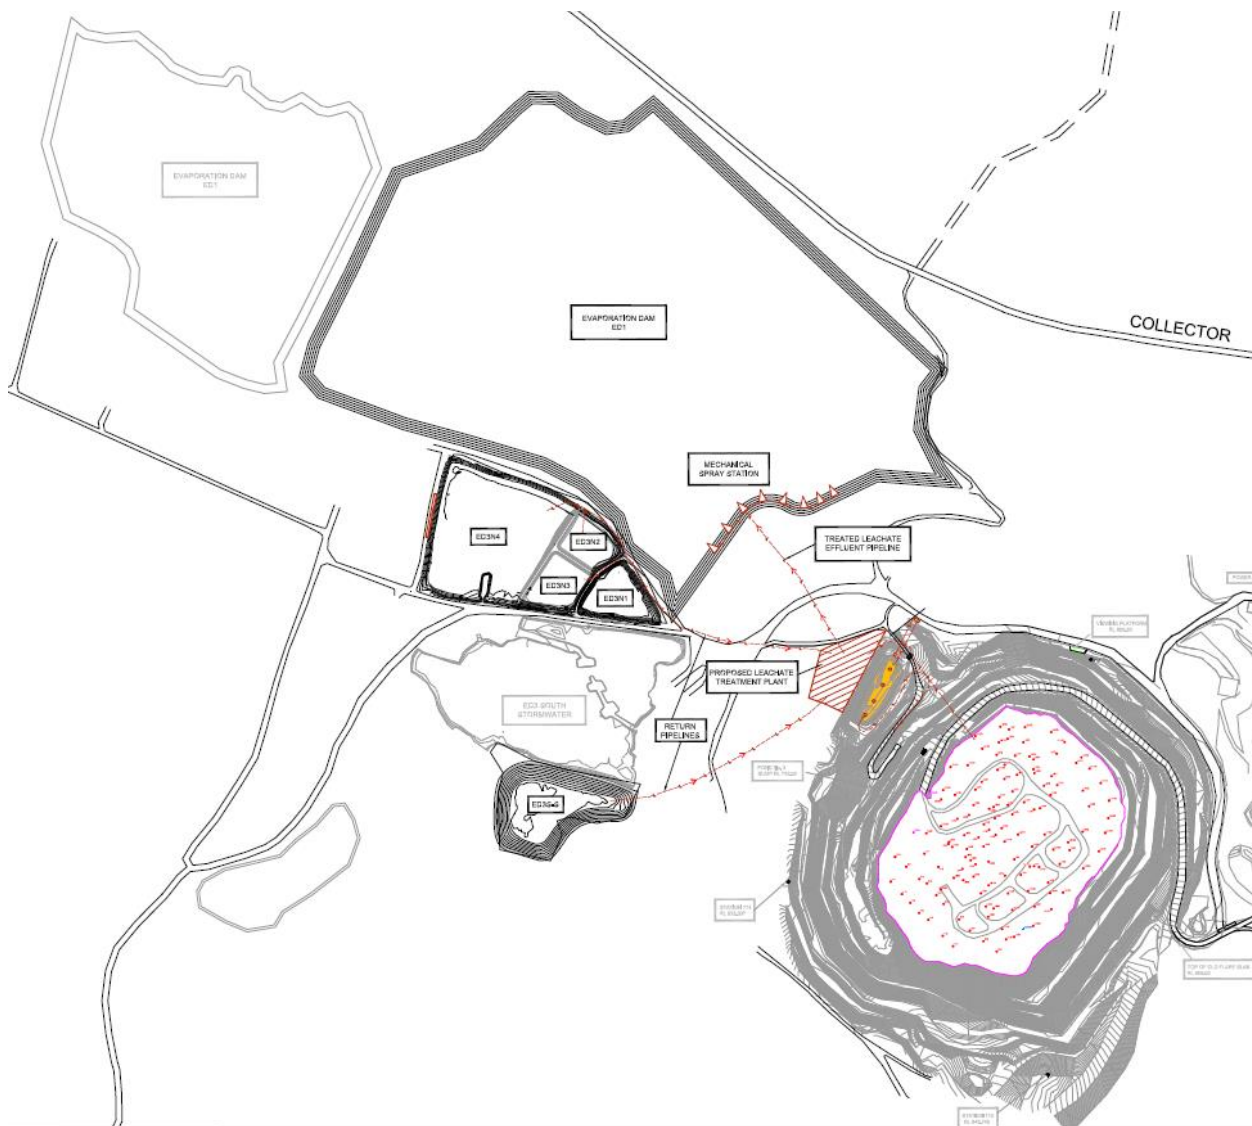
Woodlawn Long-term Leachate Treatment Solution concept layout plan
